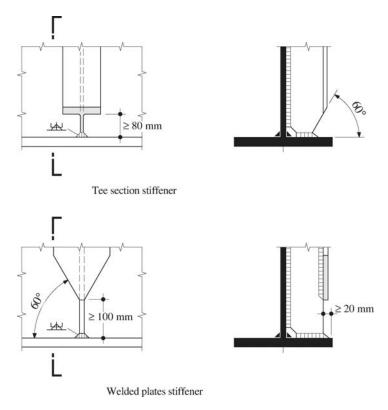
Example of the connection of a transverse Tee stiffener to a flange subject to tension.
